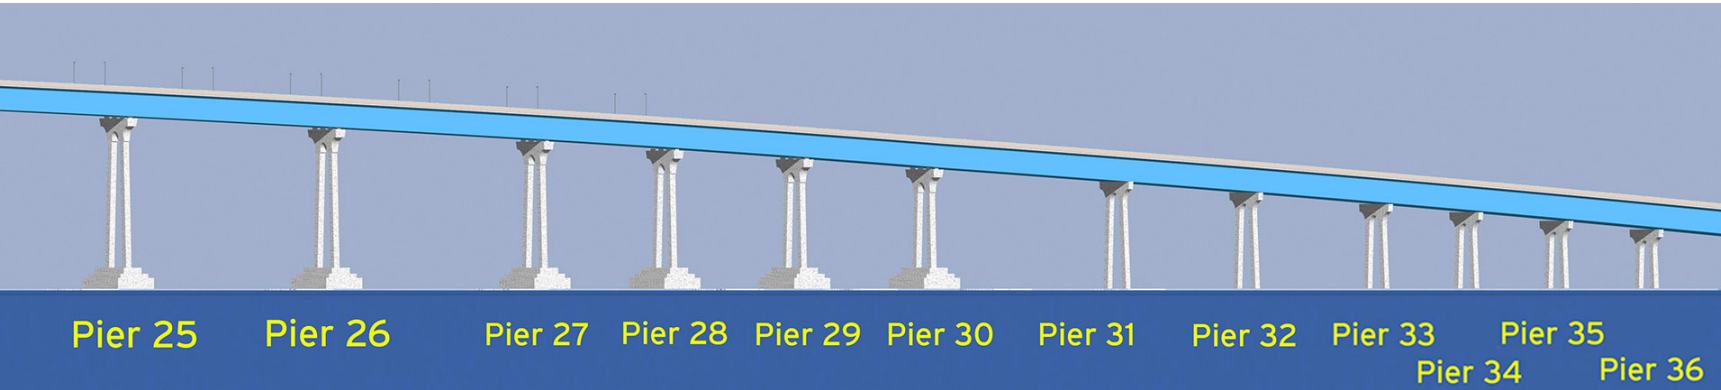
Coronado Bridge Aerial and Elevation (Pier 25 through 36) – Eastern Extent to I-5 Ramps
